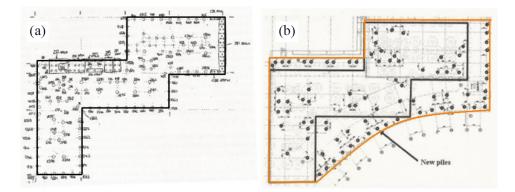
Existing and new foundation plan for the Juxon House [Giannopoulos, 2011]
